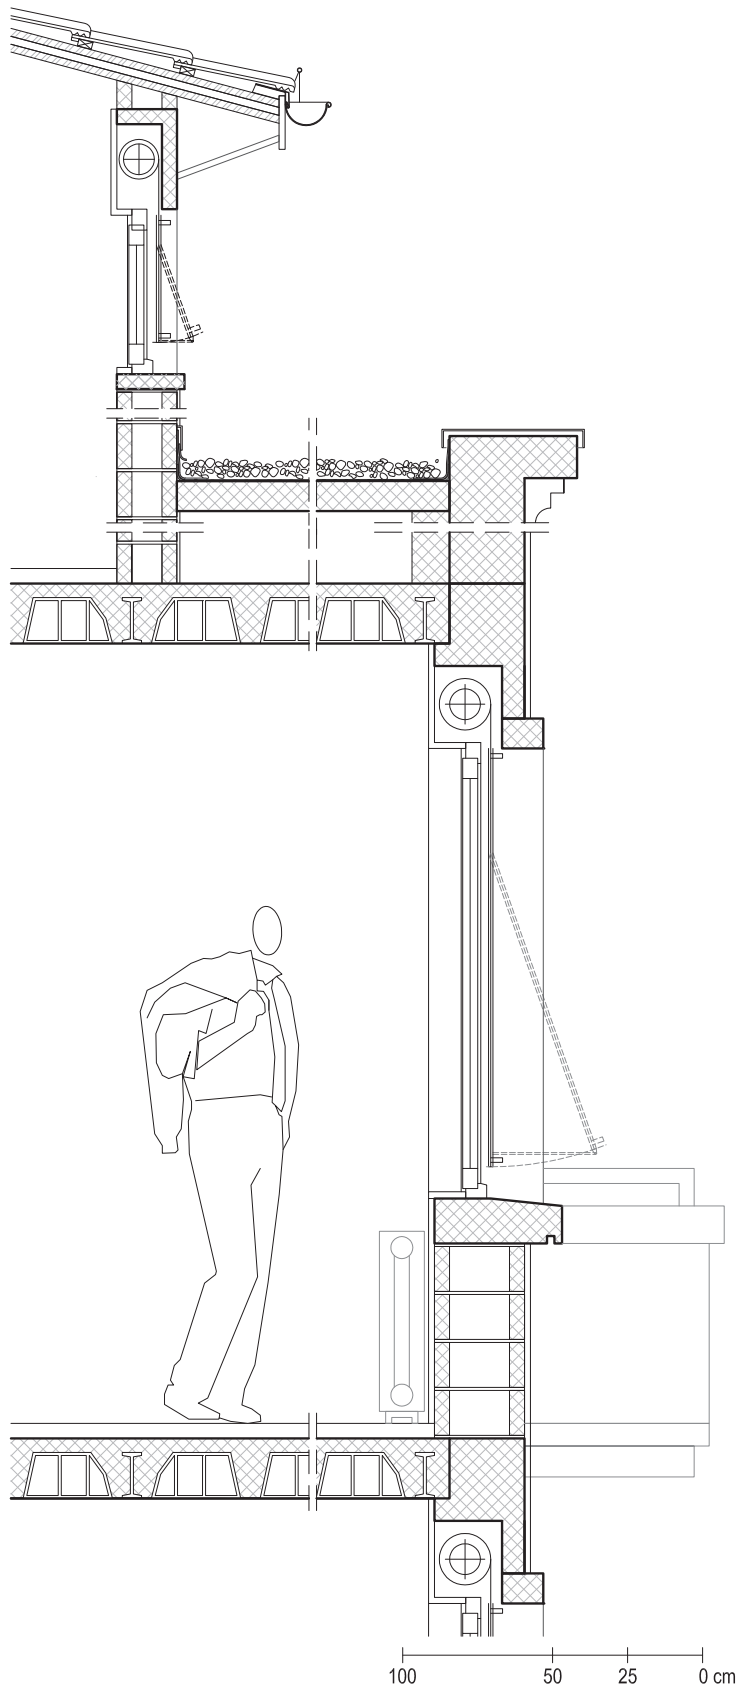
Façade and roof constructive detail, E0 – Current Status, Archetype 2.
